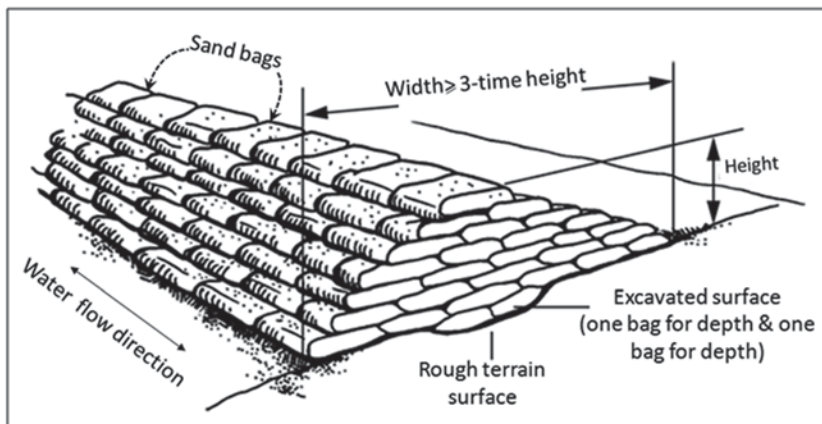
Schematic figure showing the recommended dimensions for sand bagging
